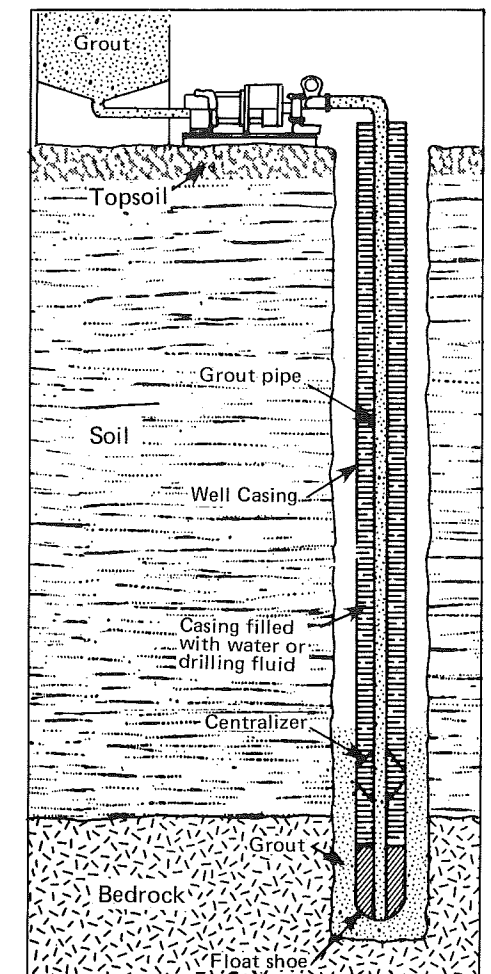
Inside tremie pipe grouting method. (From Driscoll, 1986)
